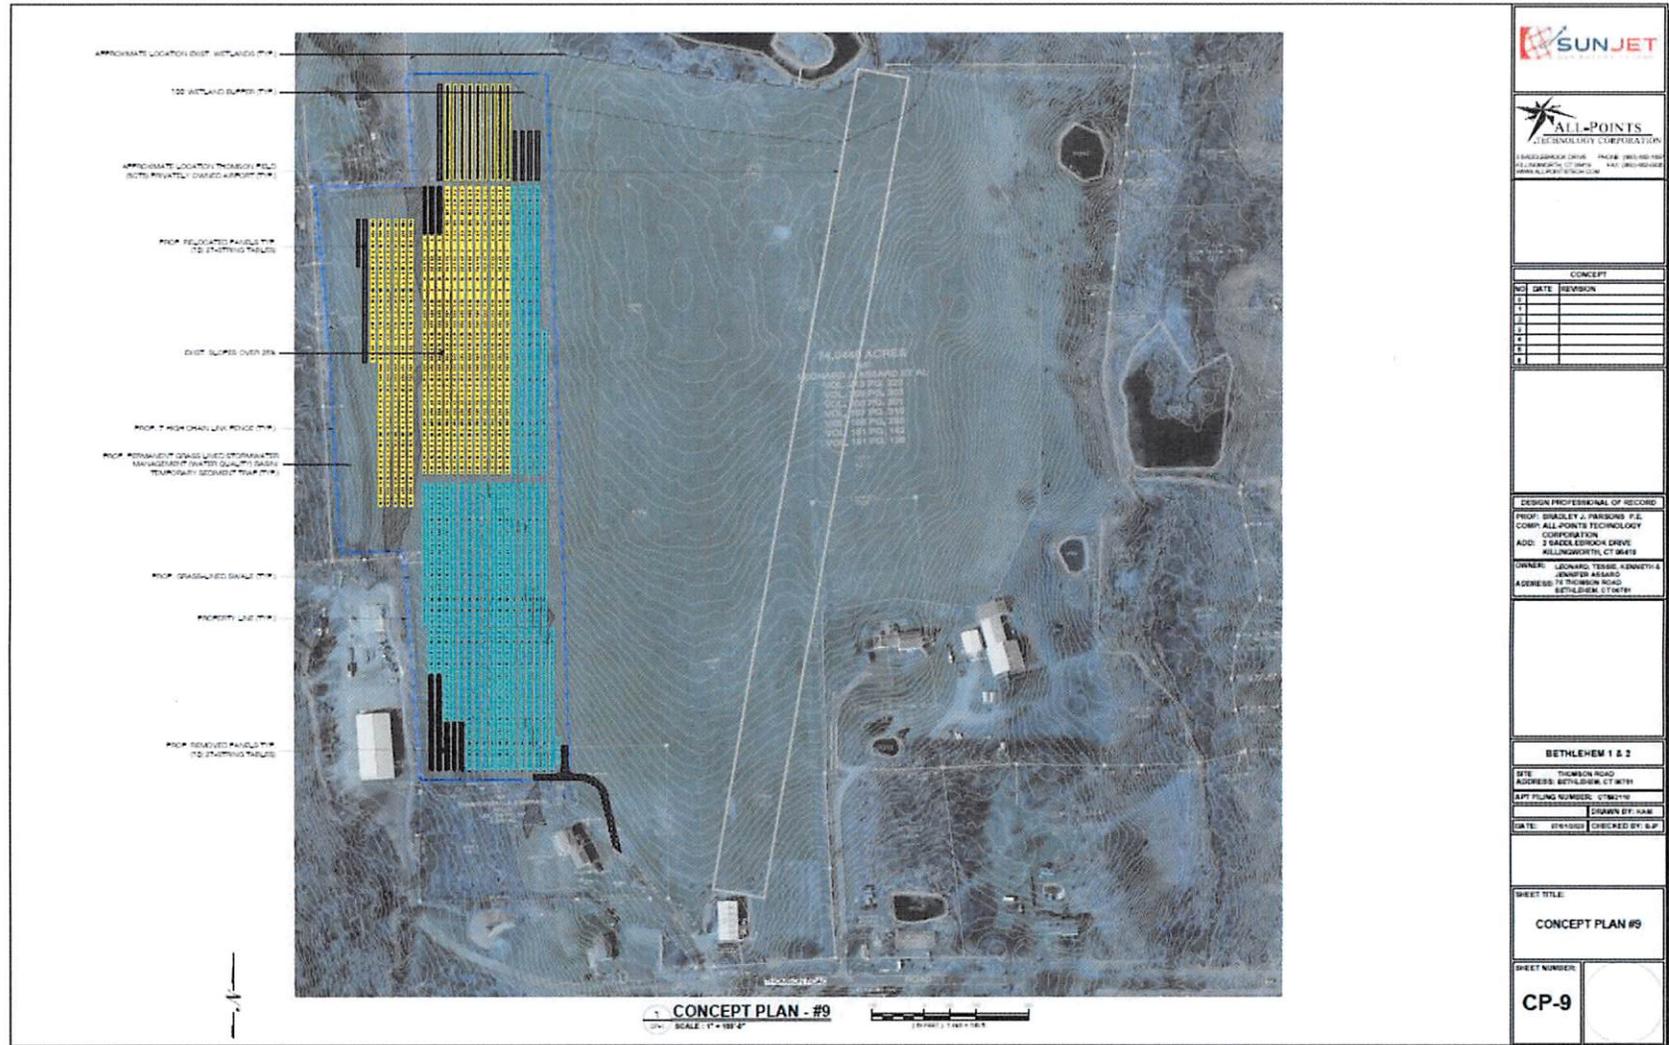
Revised Project Plans for the Sunjet Solar Facility in Bethlehem, Connecticut.
